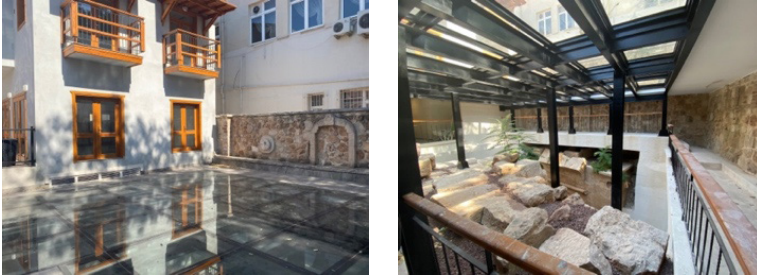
Photographs of the building located on 148 block 34 parcel (Original, 2021)
